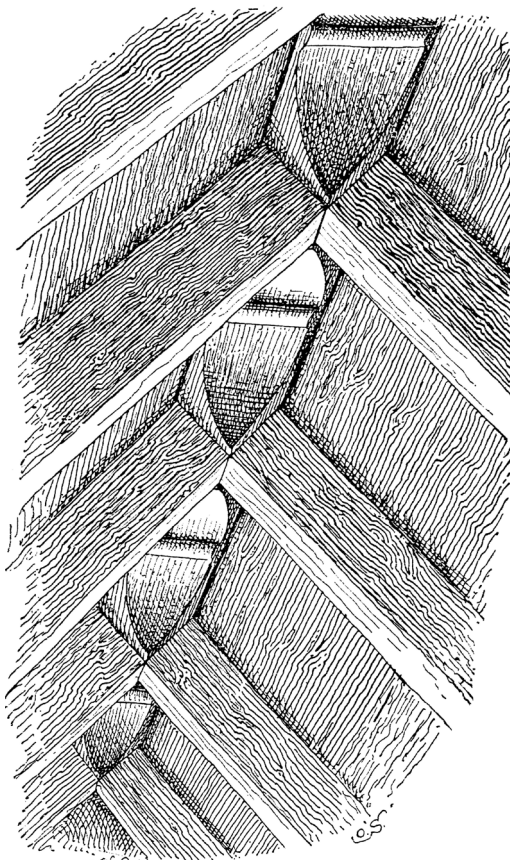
Reconstruction of the roofing in the church of Hagebyhöga in Östergötland with decorated steering plate and ridge purlin. From Janse (1902).
